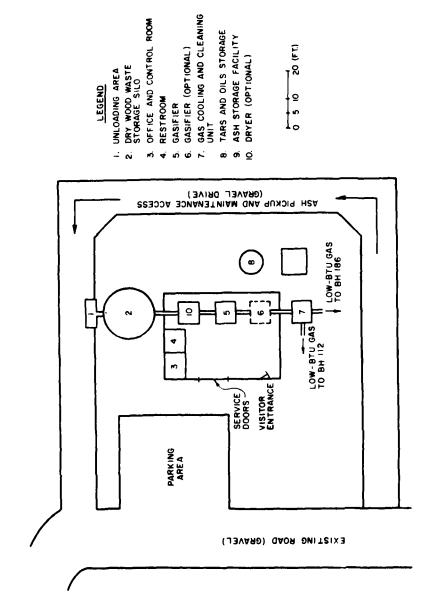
Layout of proposed gasifier site -- Alternative IV.
